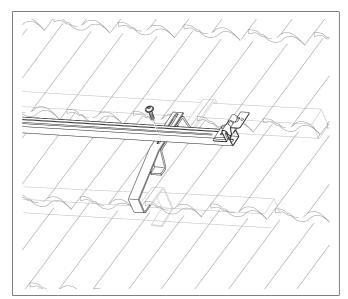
Screw preassembled profile rail to roof hook and additional roof hook
